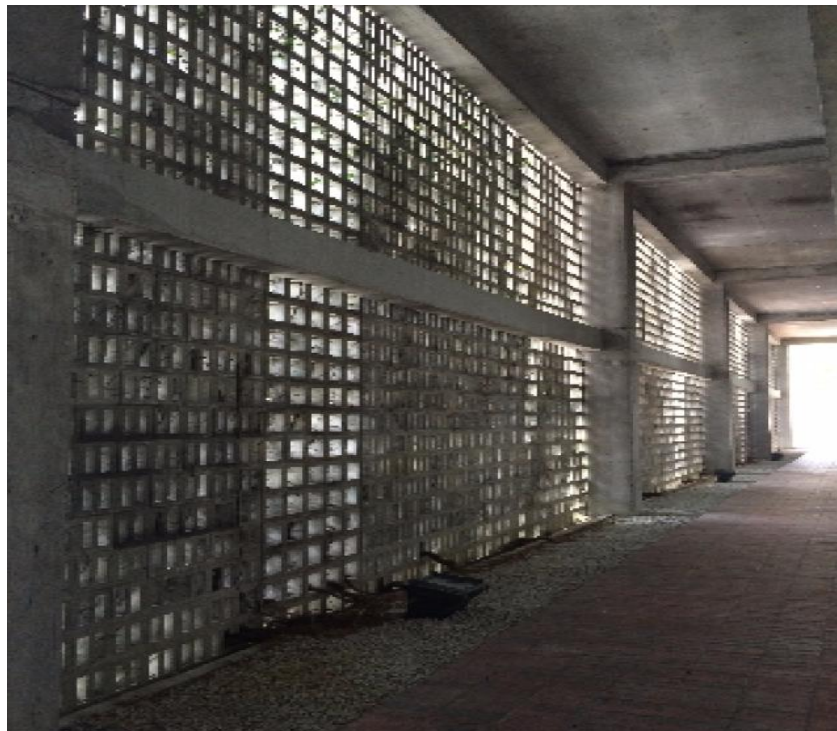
Gap between double skin of concrete vent wall and red mud brick wall
